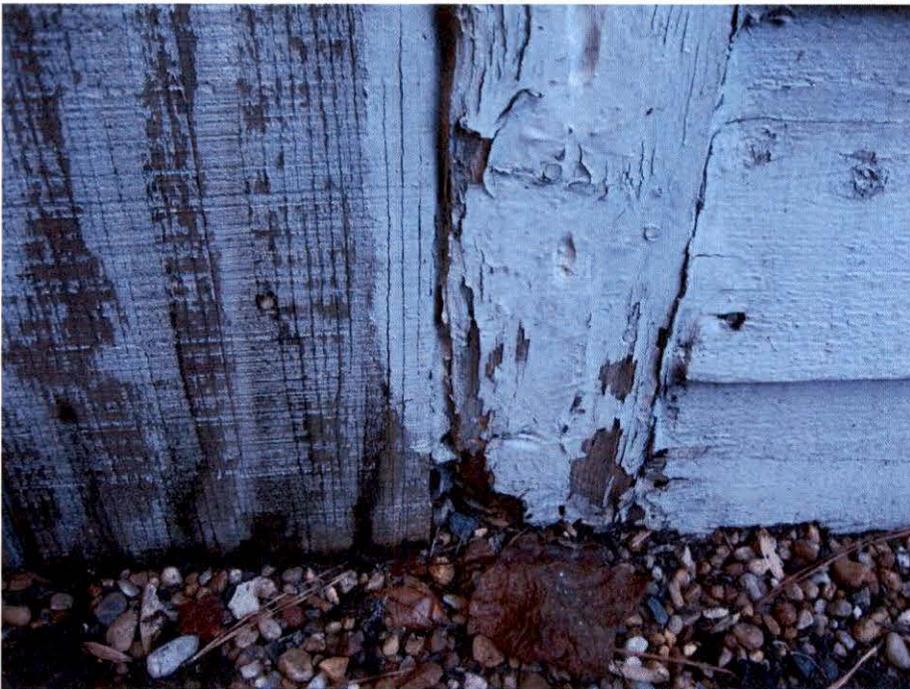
Damage to siding due to contact with ground and deferred maintenance at 1659 Merrimac Trail Bldg.
